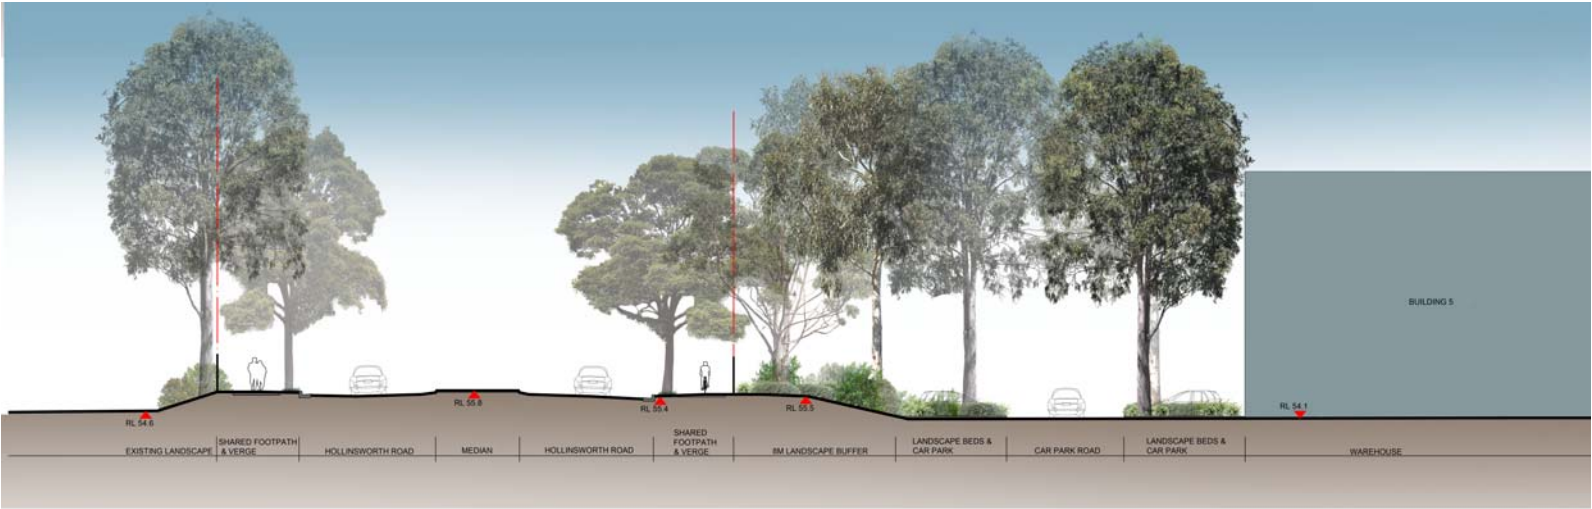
SECTION THROUGH THE NORTHERN HOLLINSWORTH ROAD BUFFER (BUILDING 5)
